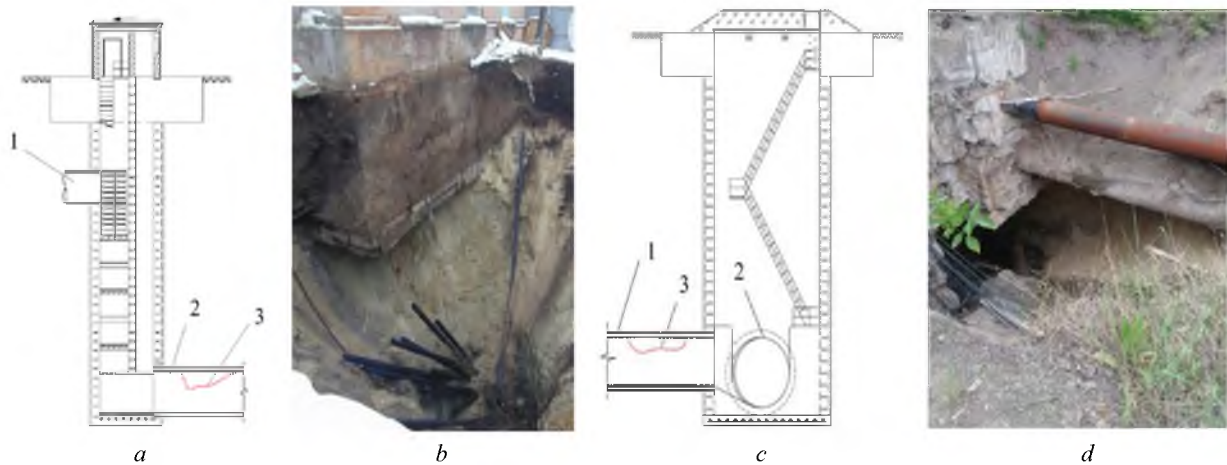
Emergency failure of the sewer tunnel on Grekovskaya street (Kharkiv, Ukraine, 2017):
